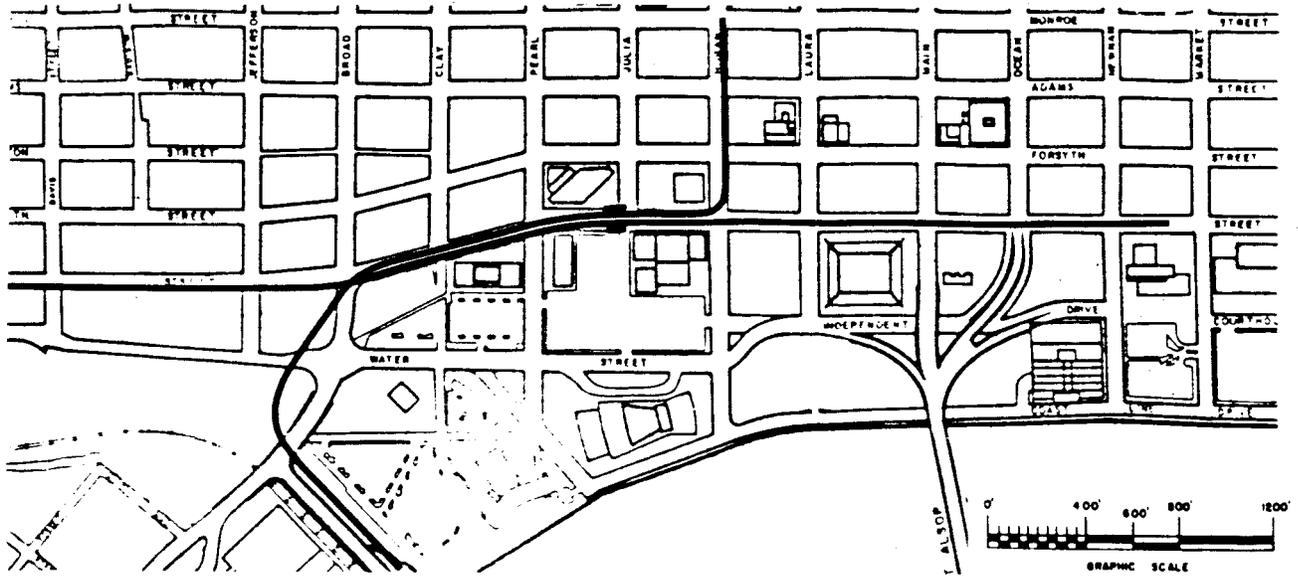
ALTERNATIVE E FOUR-GUIDEWAY CENTRAL SECTION ON BAY STREET
